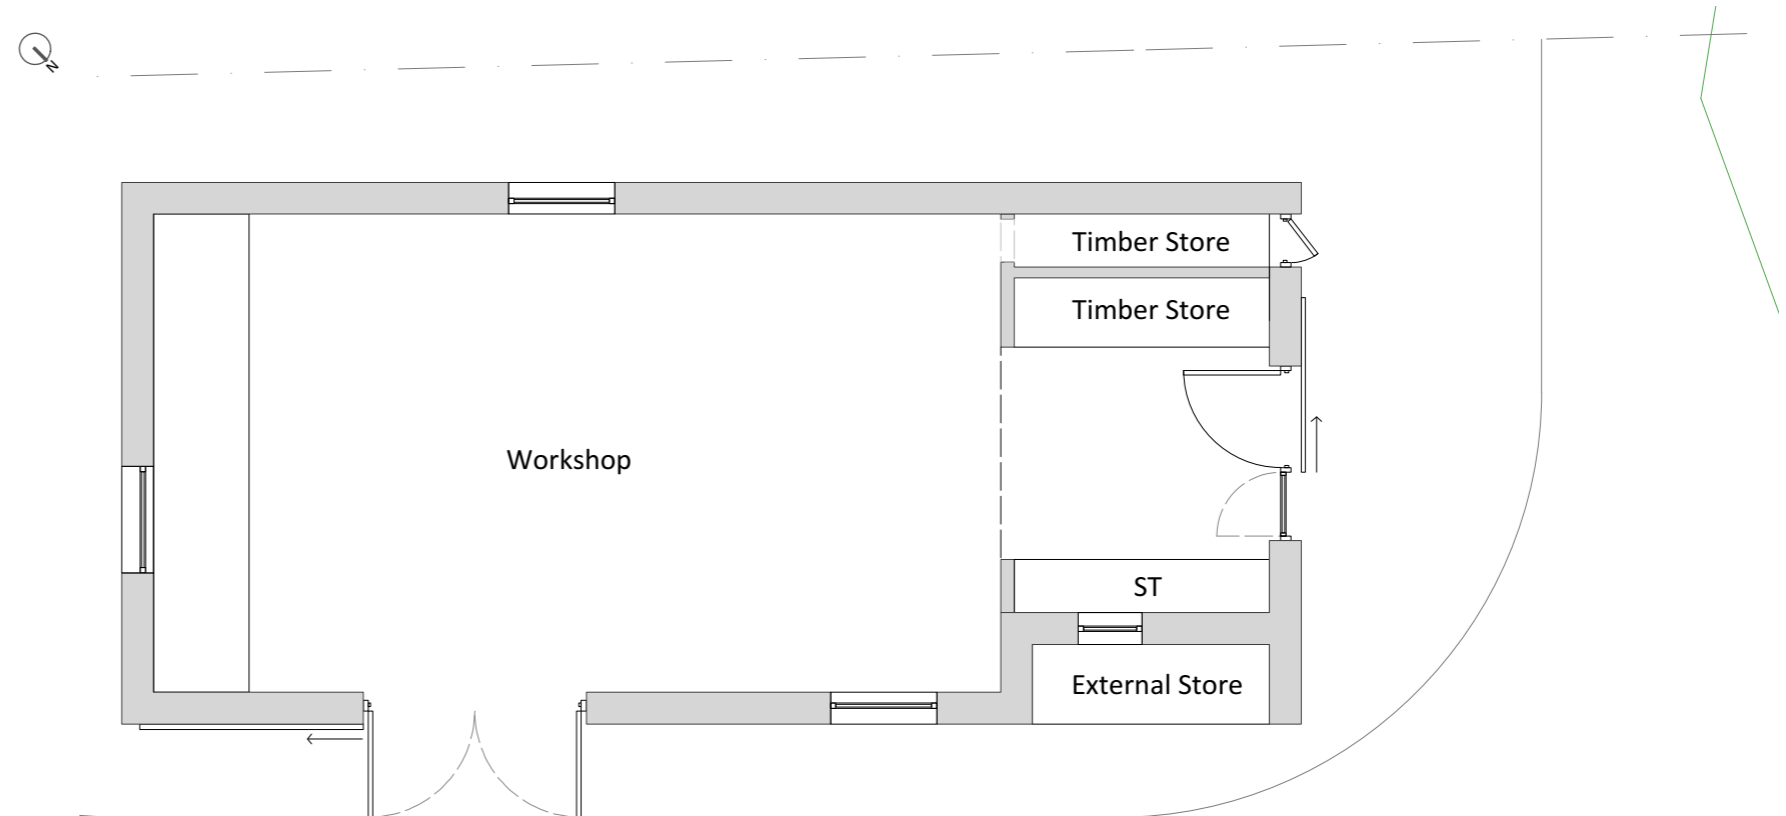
Proposed Workshop Floor Plan NOT TO SCALE
